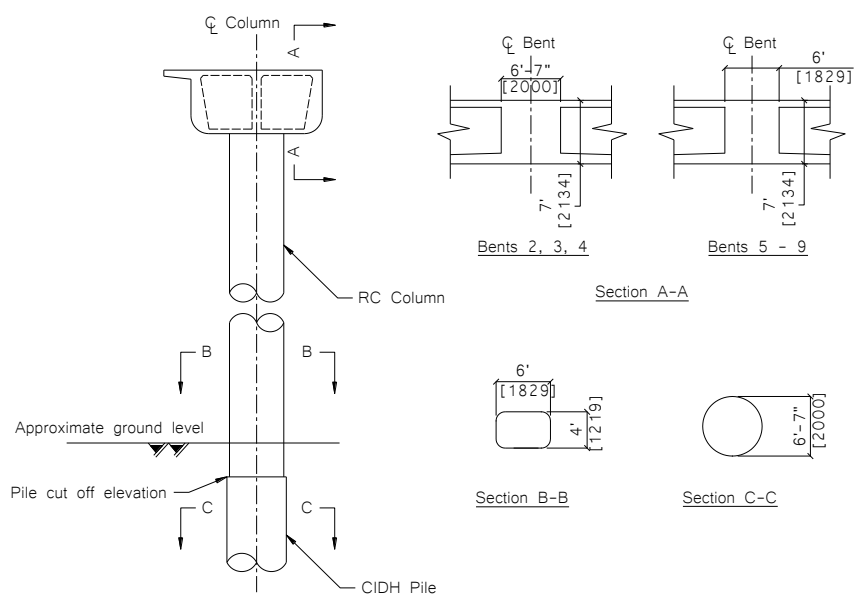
Typical bent layout of Frame 1 and 3, Bridge 5EB
